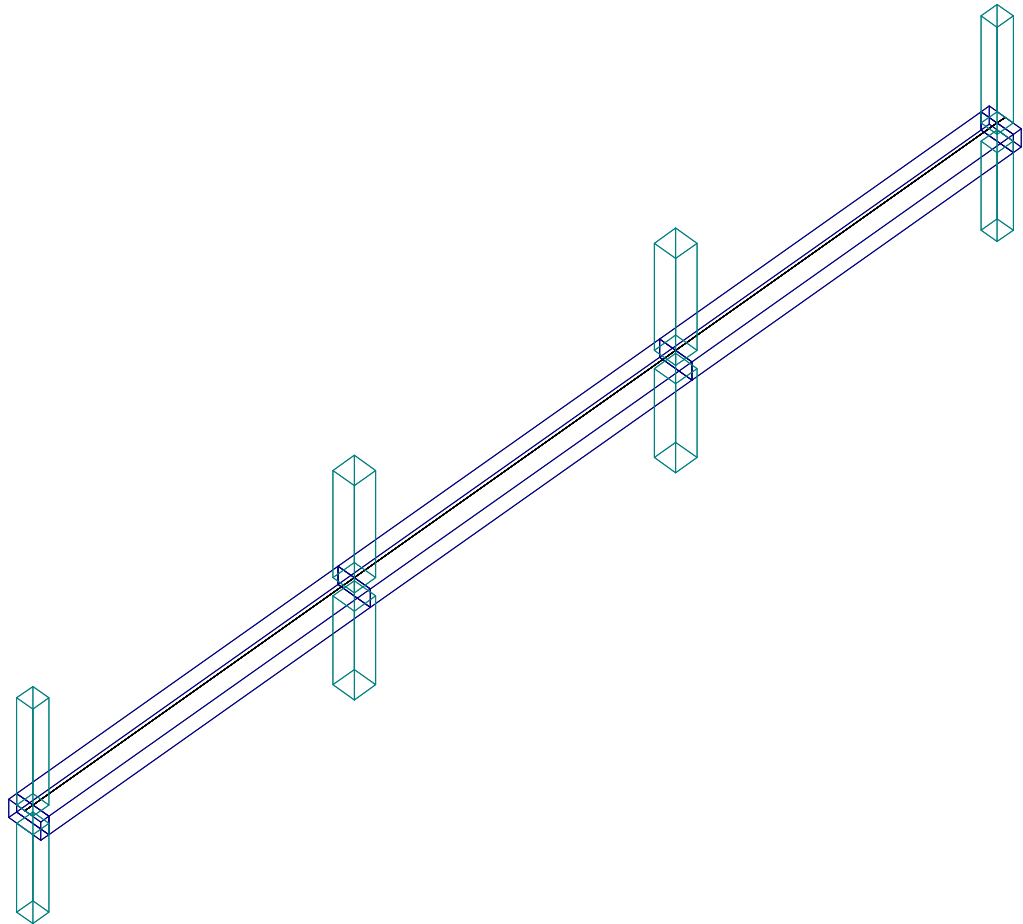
Isometric View of Typical One-Way Joist Floor System
